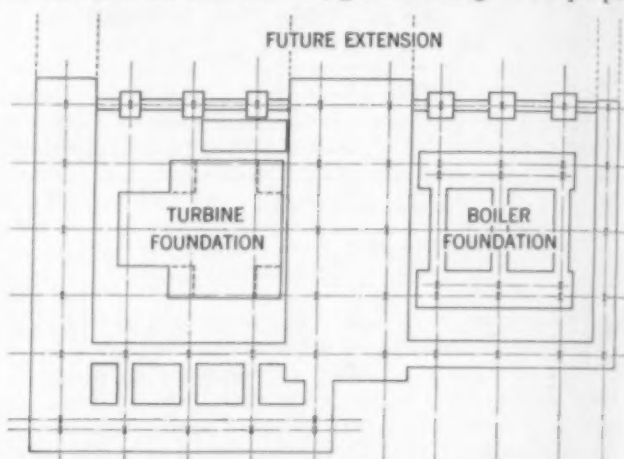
FOUNDATION PLAN FOR SPREAD FOOTINGS
